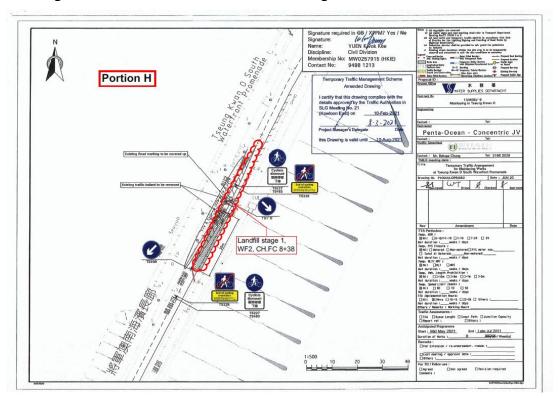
Location Plan – Landfill Stage 1 (Area FC8+38)
